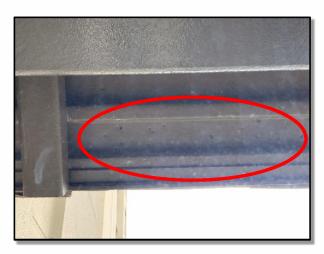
Roof Deck – Overall view of abandoned fastener penetrations.
